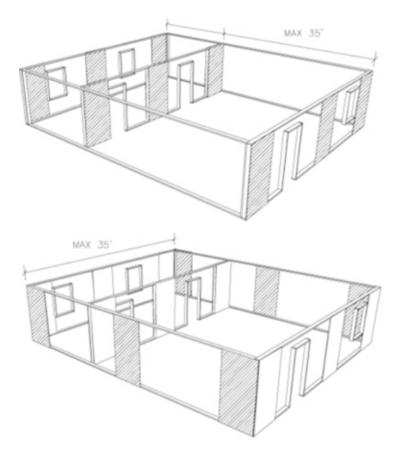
Braced wall lines spaced at 35 feet offsets in both directions
